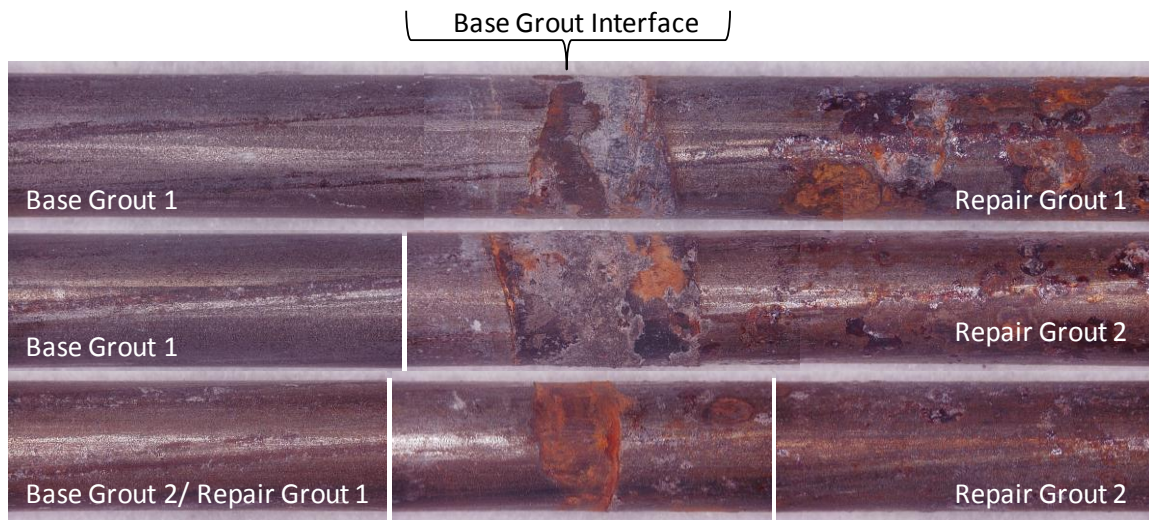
Continuous steel wire surface condition after testing (Test Setup B).
